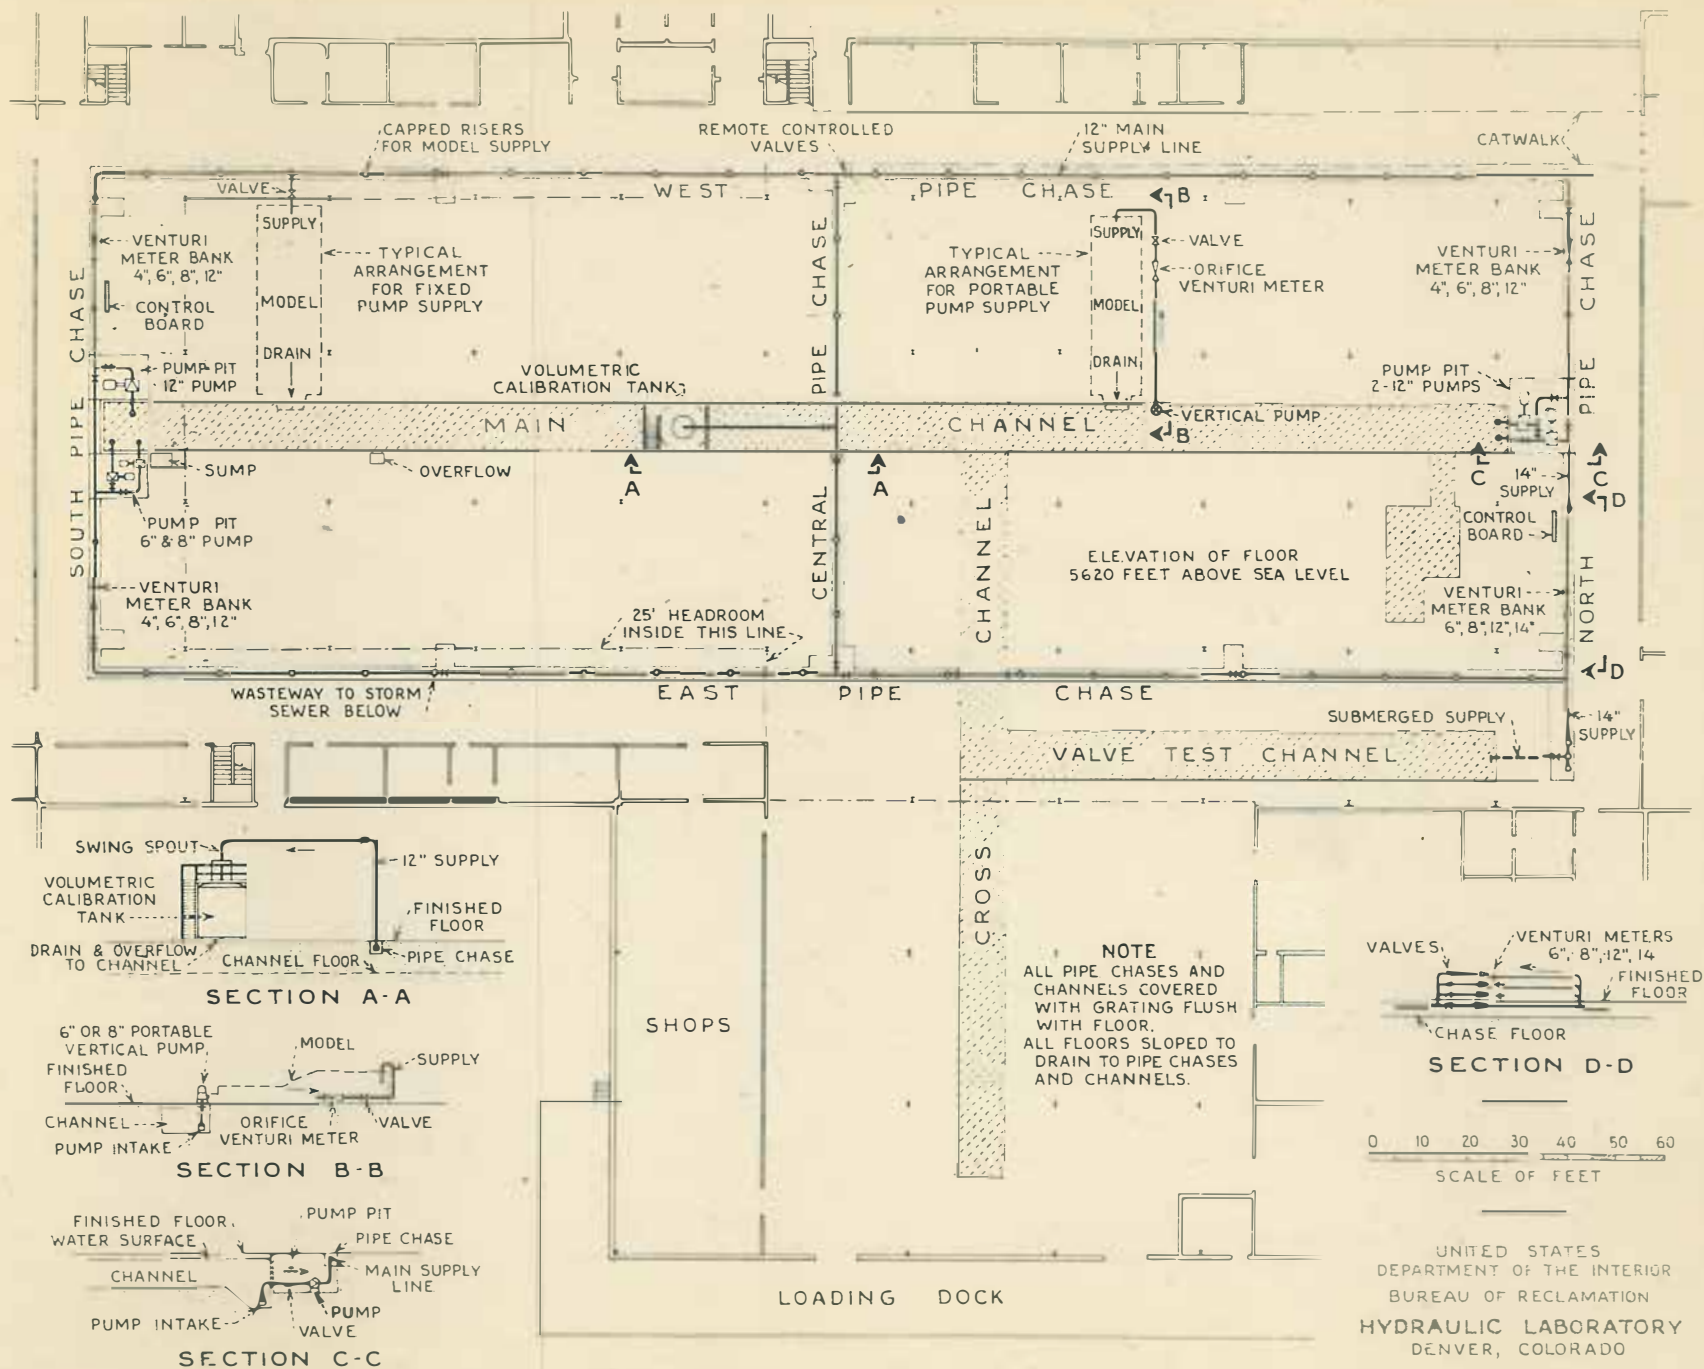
PLAN OF NEW HYDRAULIC LABORATORY IN DENVER, COLORADO
